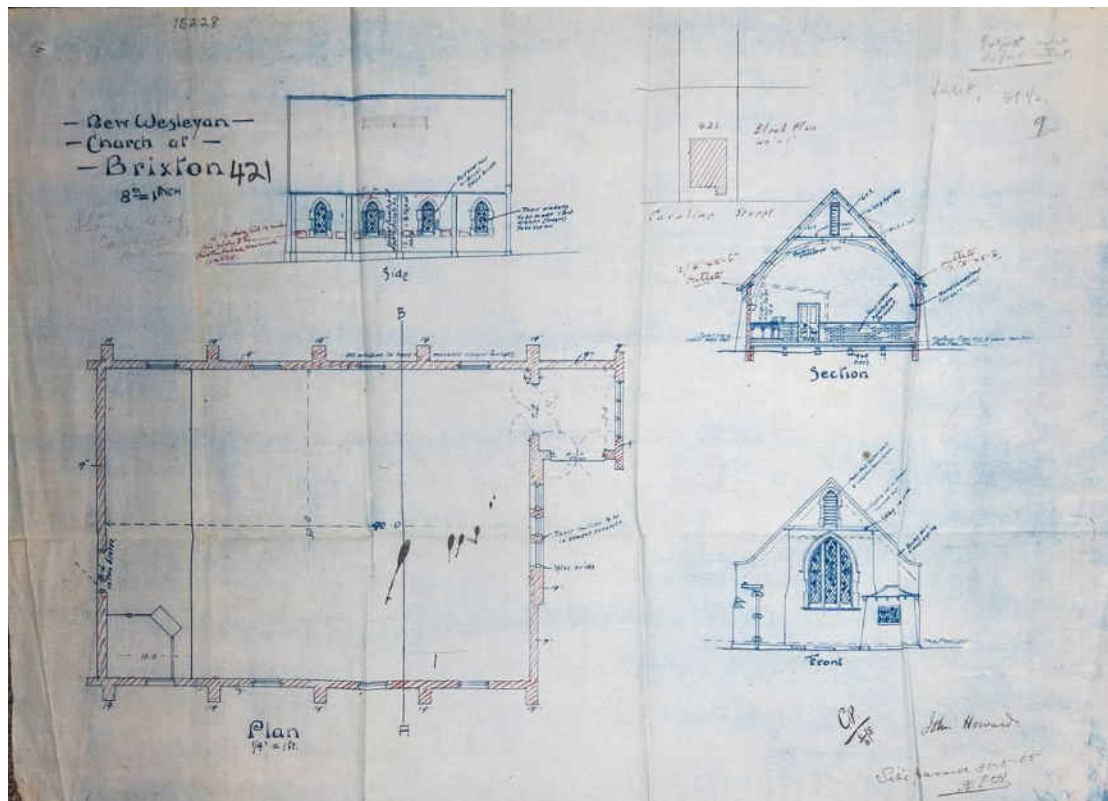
Proposed new Wesleyan Church in Brixton from 1905
